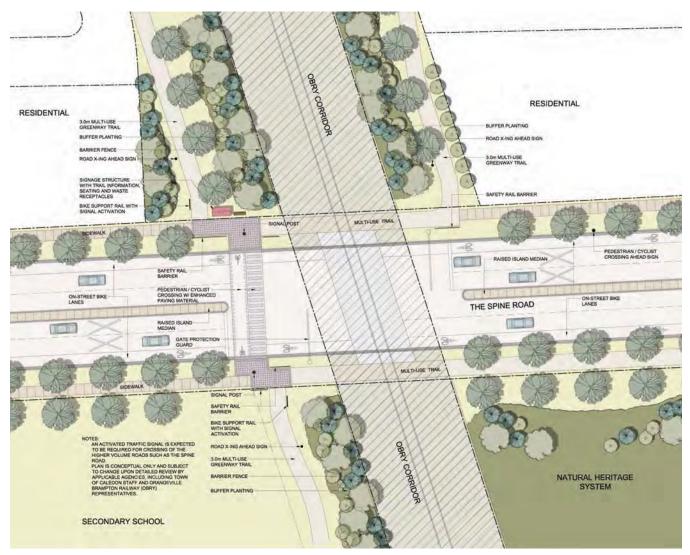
Conceptual plan showing a trail crossing of the Spine Road adjacent to the OBRY Buffer Lands, with associated trail, crosswalk and railway crossing elements.
